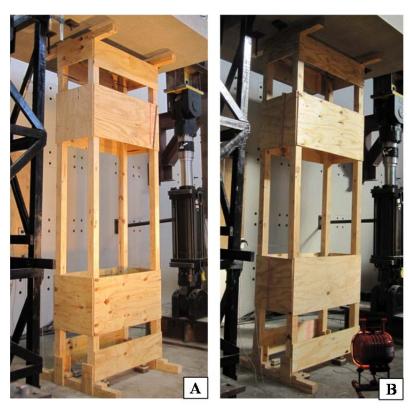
Photographs of Constructed PLP Shores in Test Frame A) 5ft Clear Span PLP B) 4ft Clear Span PLP
